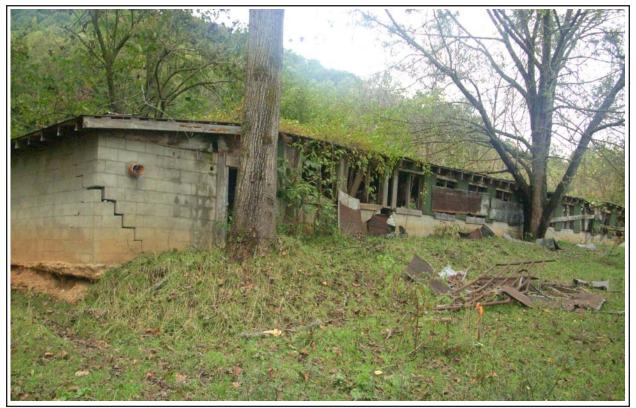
View of abandoned farm building/chicken house near Upper South Hominy Creek project area, view to northwest.
